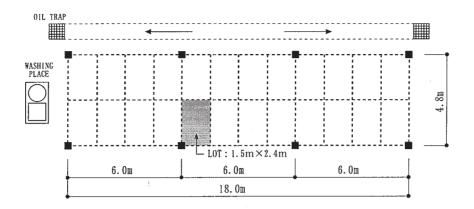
Floor Plan of Fish Preparation Buildings
